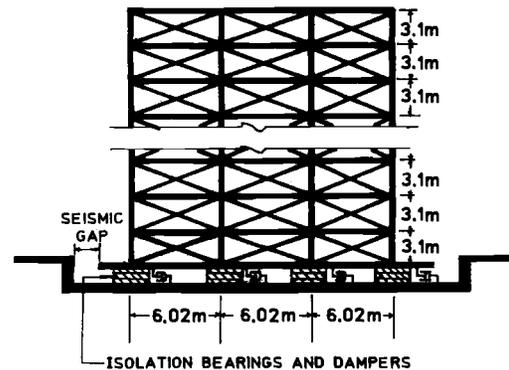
Side elevation of 14 and 20 storey buildings (Base-Isolated)
